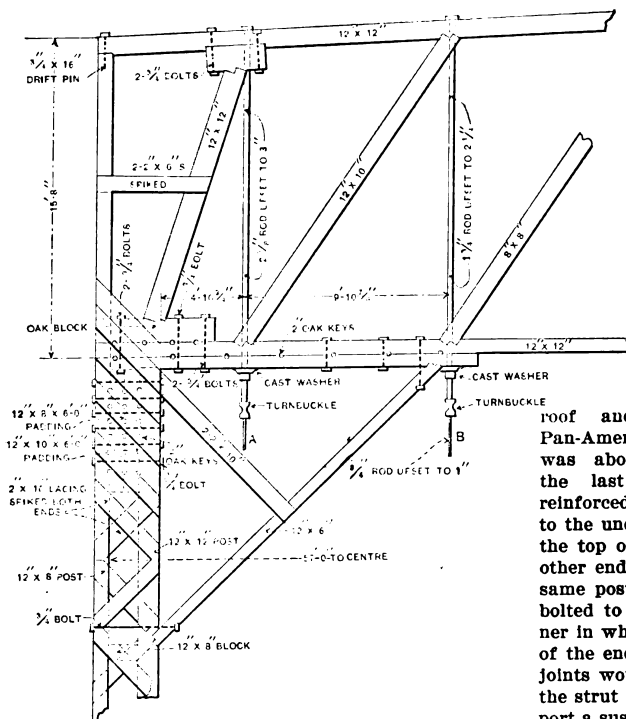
Good Example of End Construction of Heavy Wood Truss Supported by Wooden Posts.
